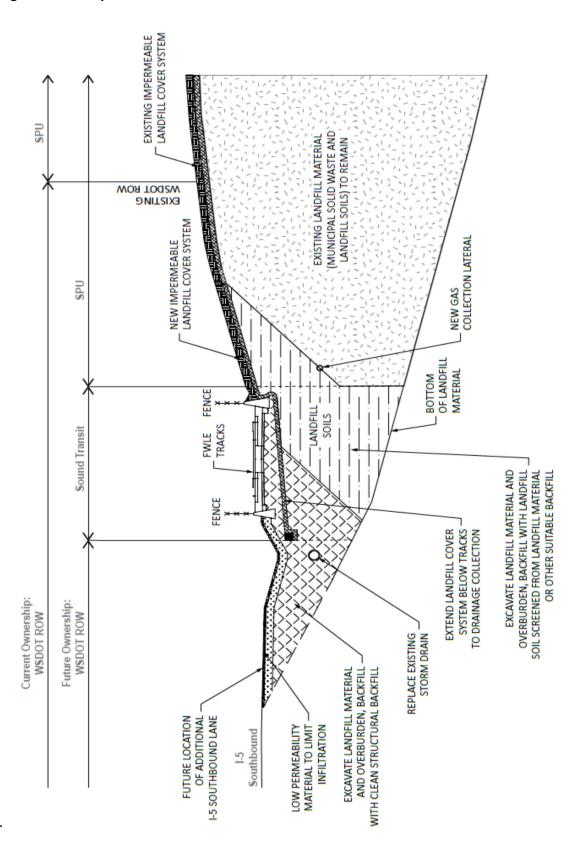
Conceptual Waste Removal and Backfill Cross Section
